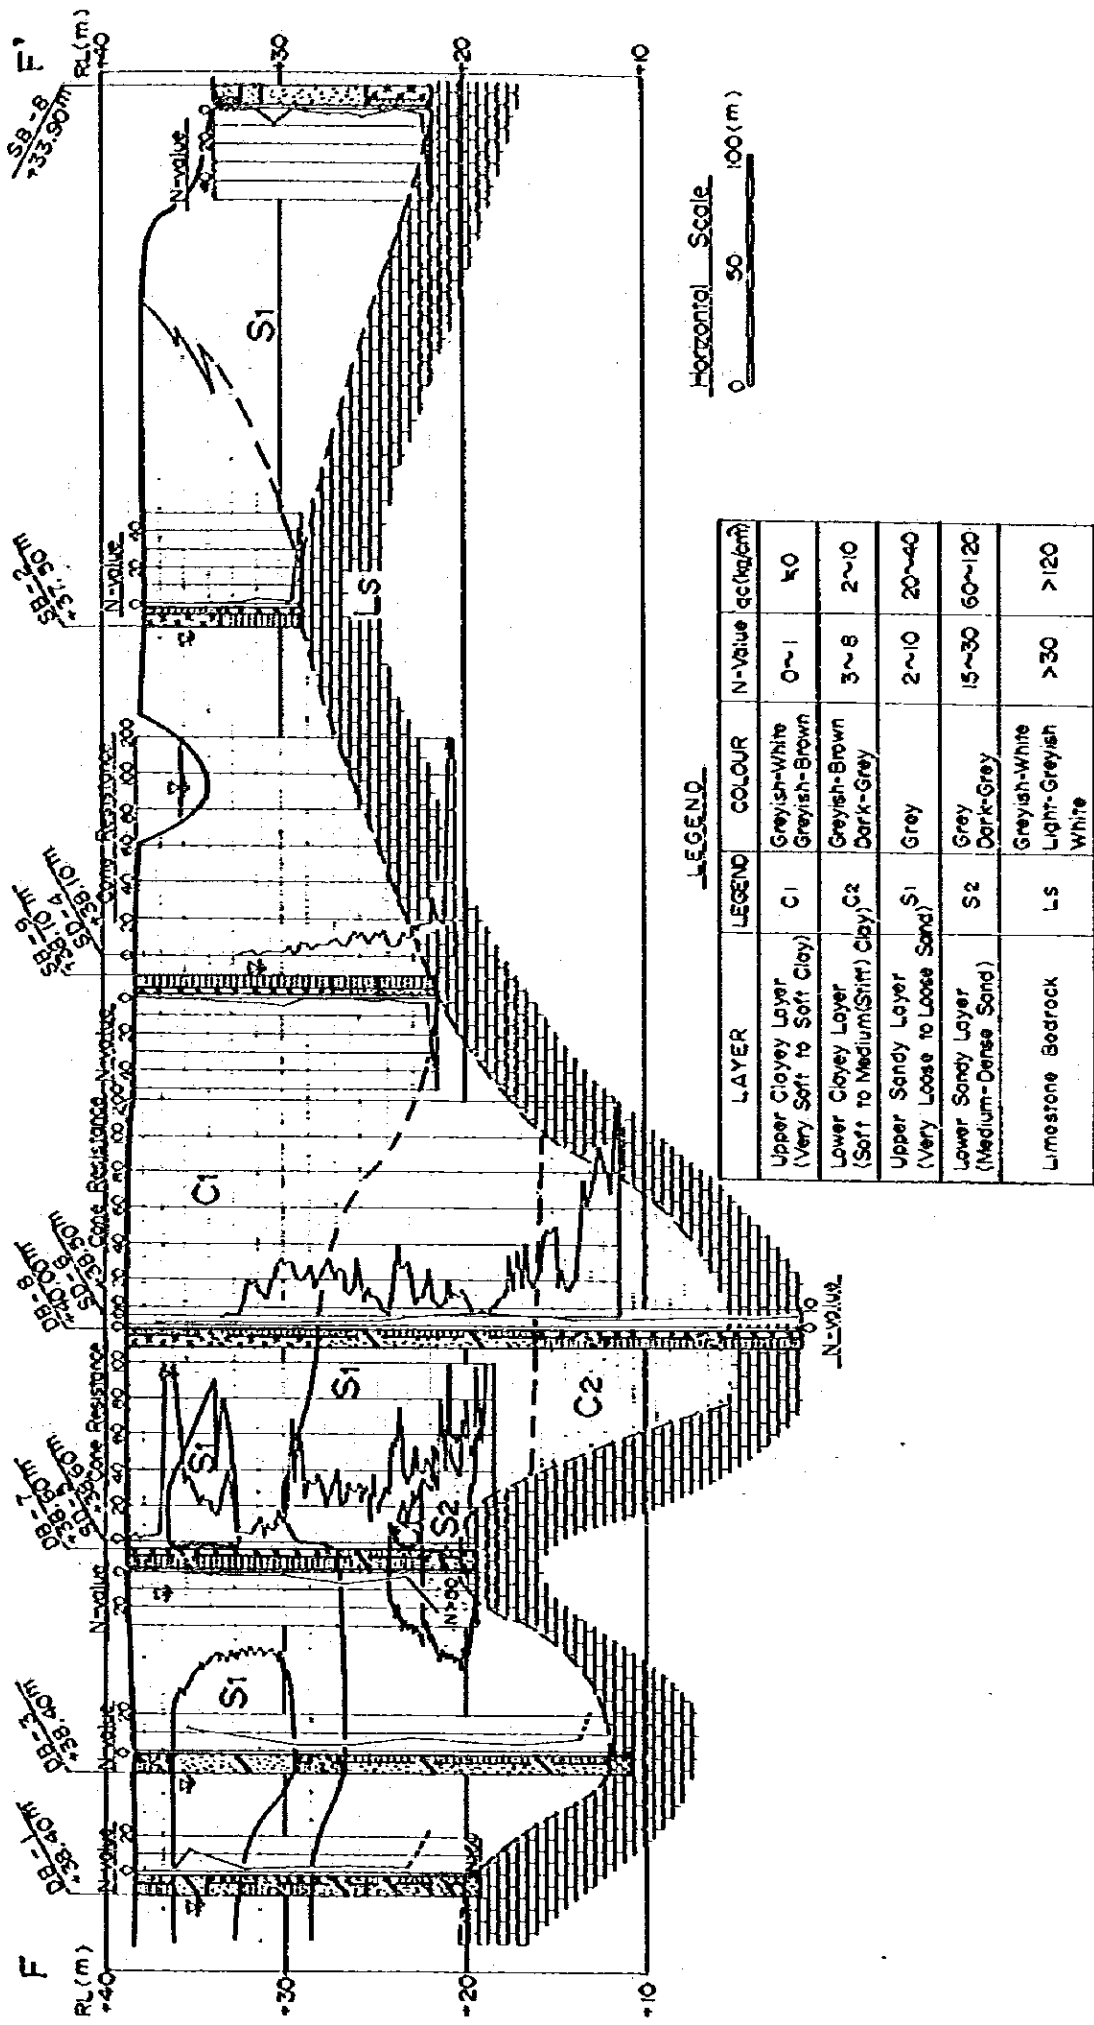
Soil Profile at Sentul, Cross Section F-F'
